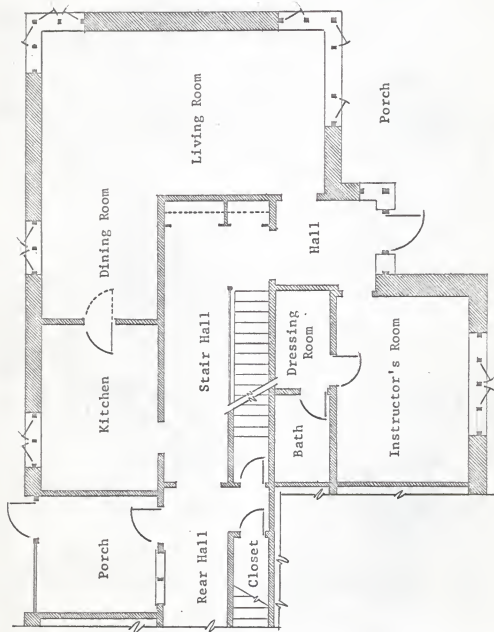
Main floor plan of Margaret Ahlborn Lodge.
